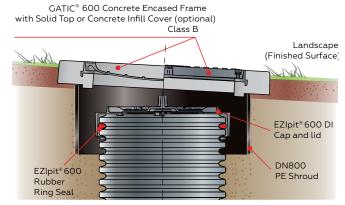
EZIpit® 600 Cover arrangement (Sloped surfaces).
